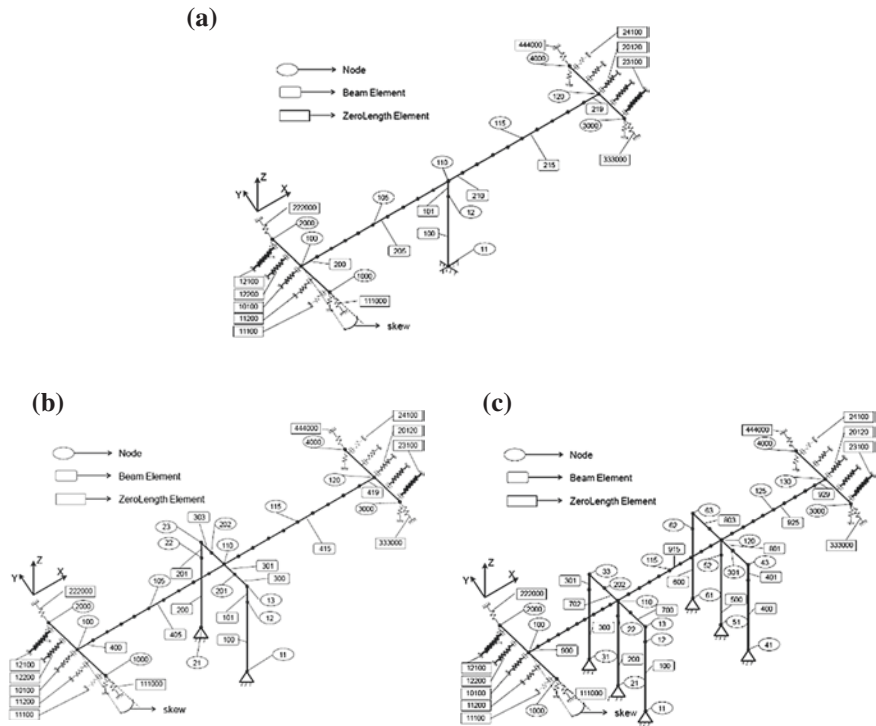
Modeling of the analyzed bridges [3]. a Bridge A, b bridge B, c bridge C
